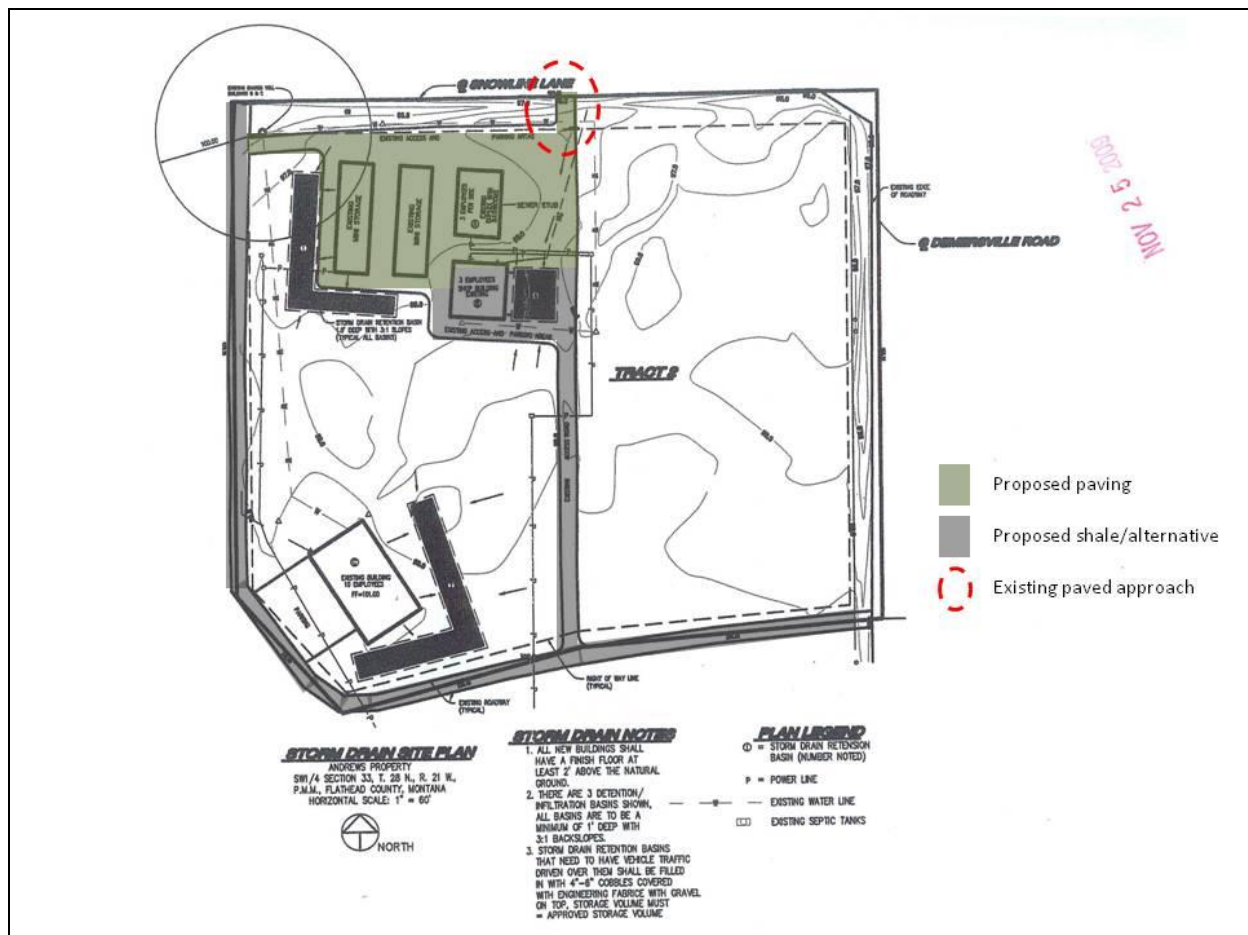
Alternative B – recommended paving around mini-storage and duplex buildings.
